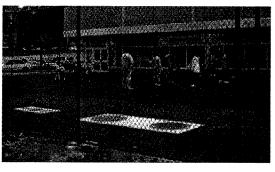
Porous asphalt playground at Penn New School in Philadelphia.
